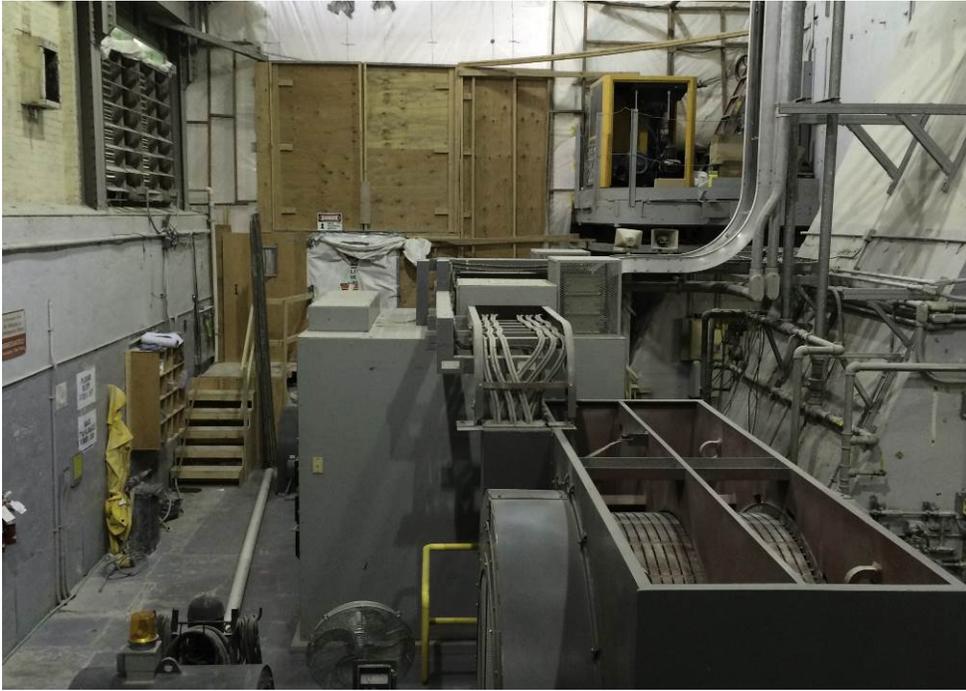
Operating side of Nine Mile powerhouse with a dust protection wall in the background.
